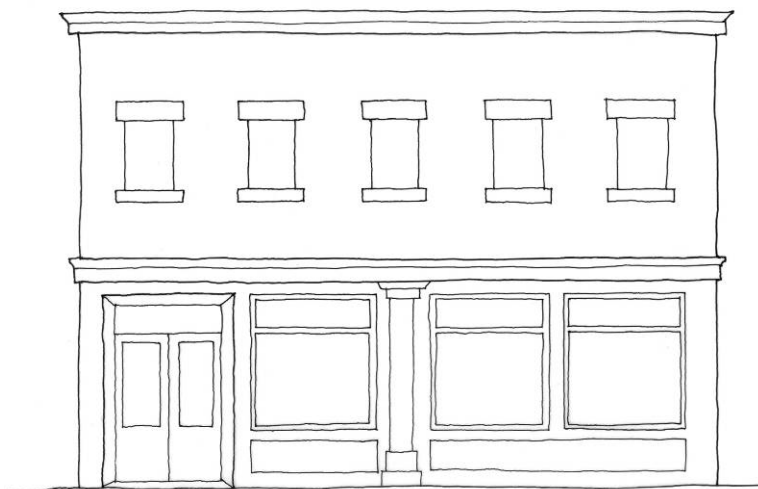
Correct façade proportions. Ground-floor windows and door match the shape and style of the second-floor windows. The large pane is as big as two upper story windows. The height of the doorway aligns with the top of the window frames.
